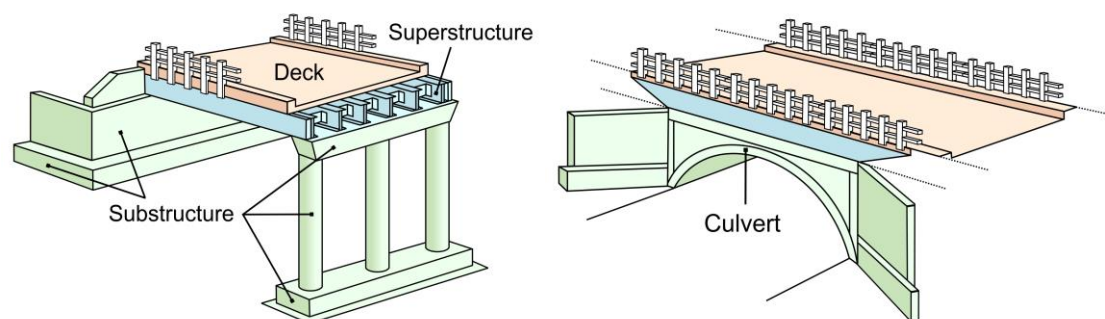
ANATOMY OF A BRIDGE OR CULVERT
